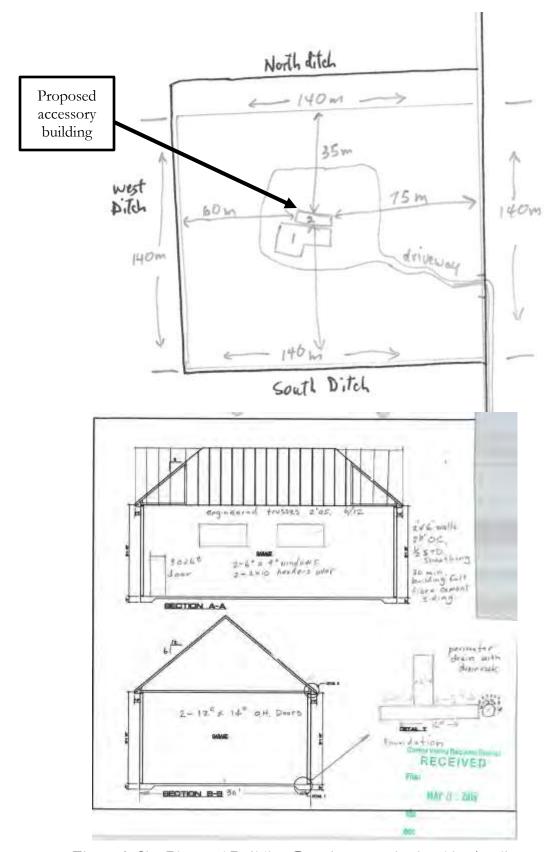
Site Plan and Building Drawing, as submitted by Applicant
